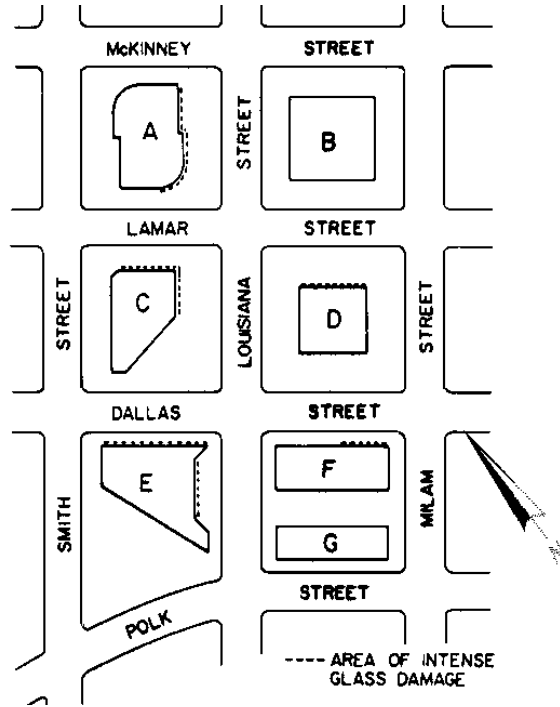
Plan View of Damaged High-Rise Building Towers (Beason, et al., 1984).
